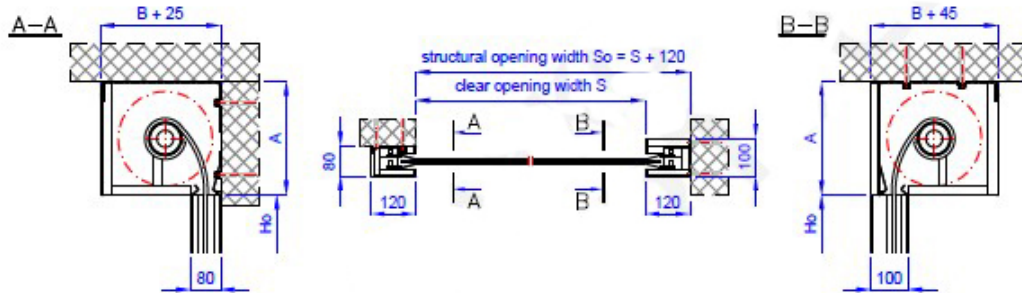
Fire protection curtain door EI120, mixed mounting
